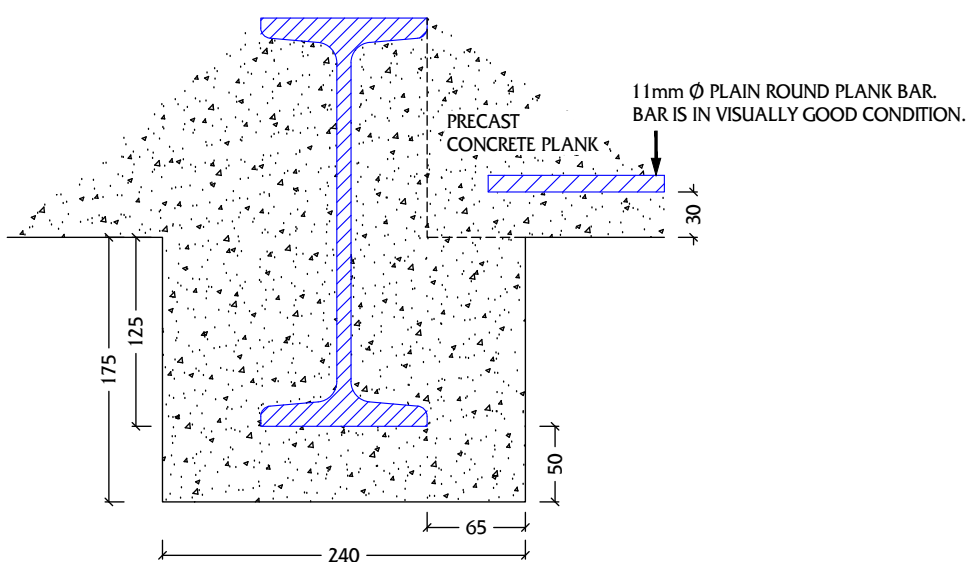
PART SECTION LOOKING WEST THROUGH 1ST FLOOR PRIMARY BEAM - SURVEY AREA K/10-11 SCALE 1:5
